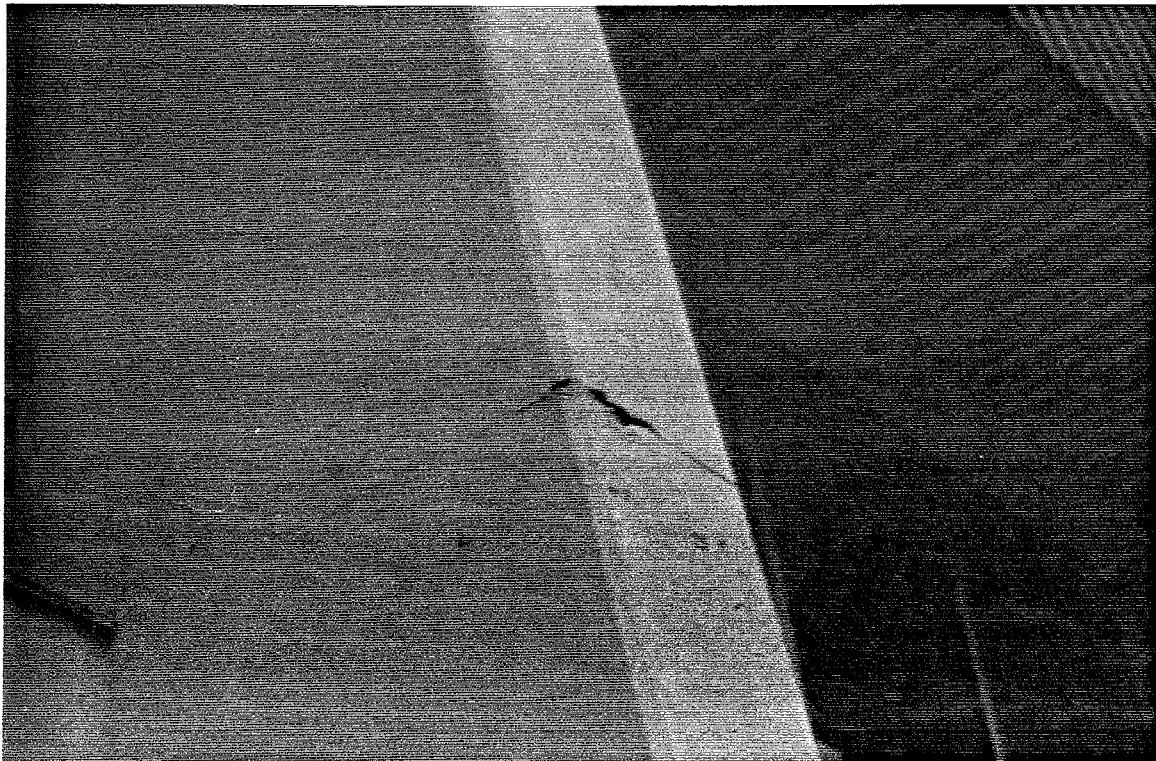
Close-up of horizontal cracking in column.
